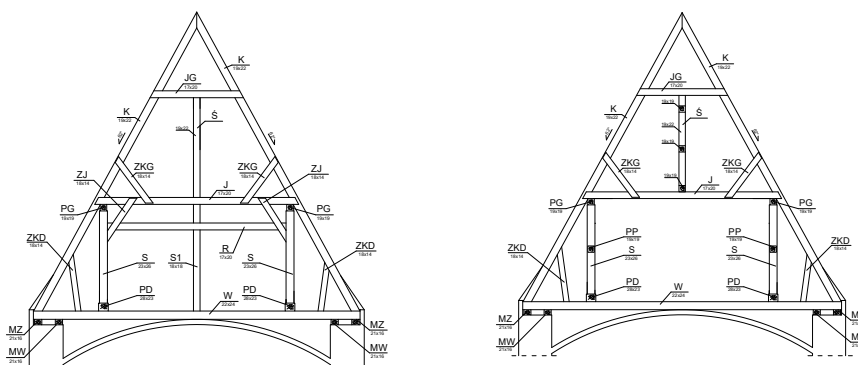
Truss cross-section - full truss W1 Fig. 2. Truss cross-section - empty truss W1a
